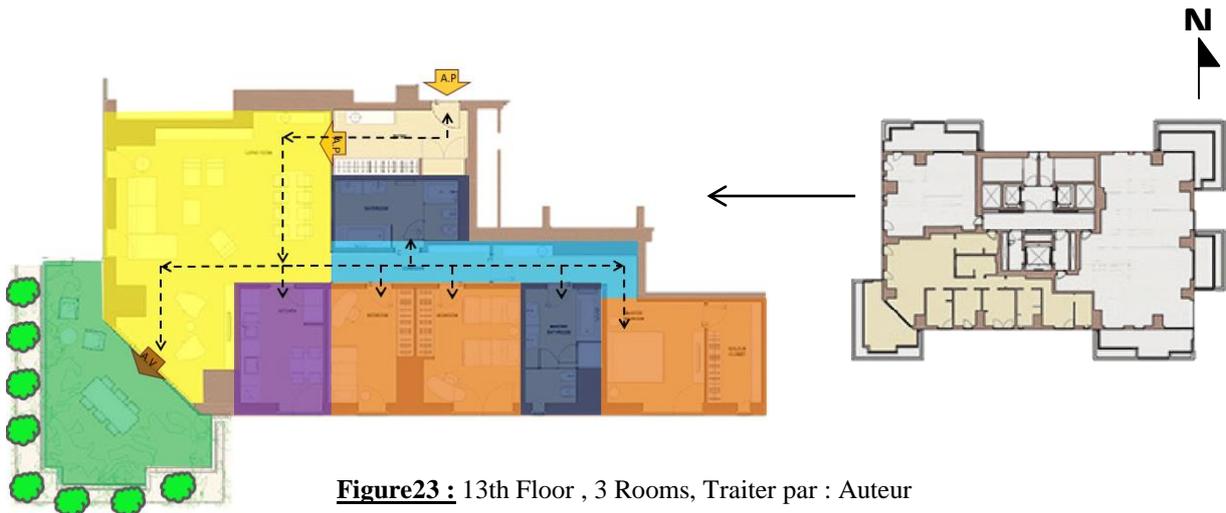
13th Floor , 3 Rooms, Traiter par : Auteur
